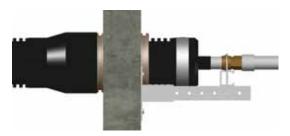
Wall Sleeve with Heat Shrink Seal Kit
